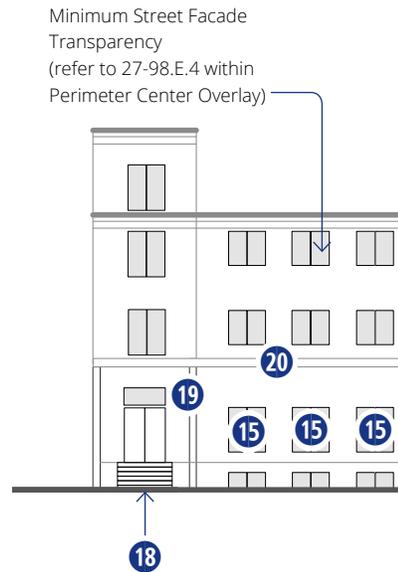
Civic Building: Street Facade Design Requirements
